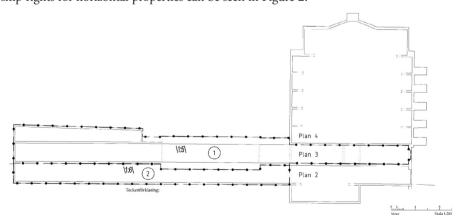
Example of 3D subdivision of a building creating separate ownership rights for horizontal properties: Offices (Plan 2), parking facilities (Plan 3) and dwelling purposes (Plan 4). Source: Lantmäteriet, the Swedish mapping, cadastral and land registration authority.
